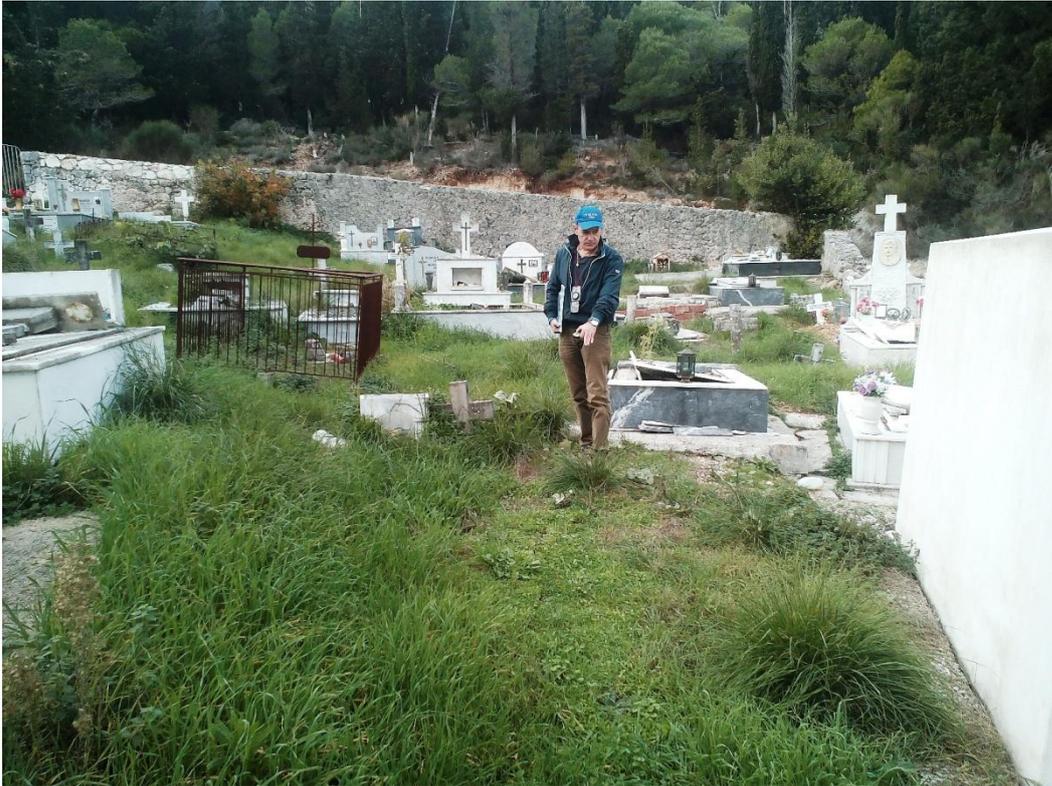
Field photo of damaged cemetery at Ypapanti church, to the west of Dragano village. View to the north. Date photo was taken 21 Nov. 2015.
